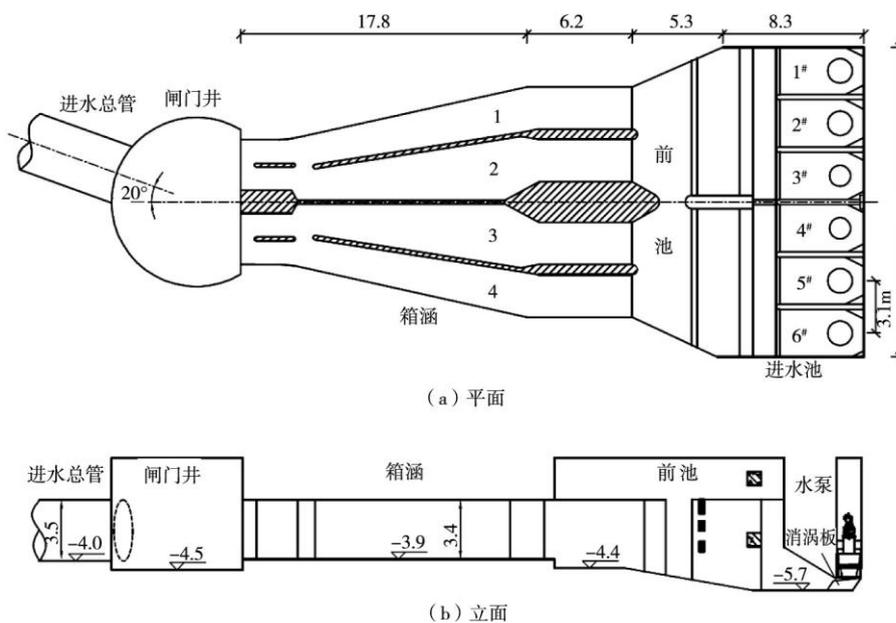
Layout of Plane and Facade of Urban Rainwater Pump Station (Unit: M)
